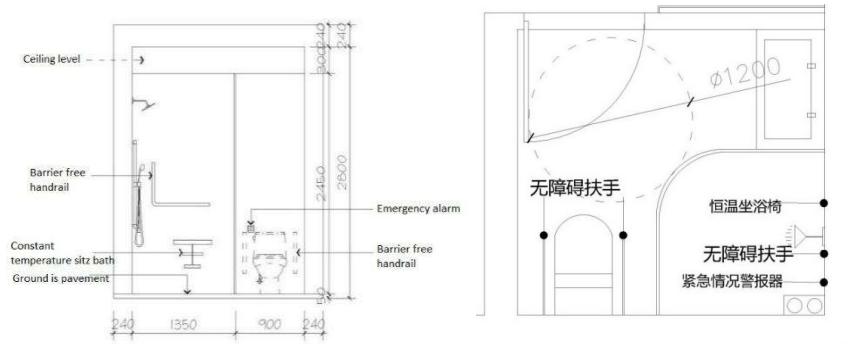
Bathroom Floor Plan Bathroom Upgrade Plan
